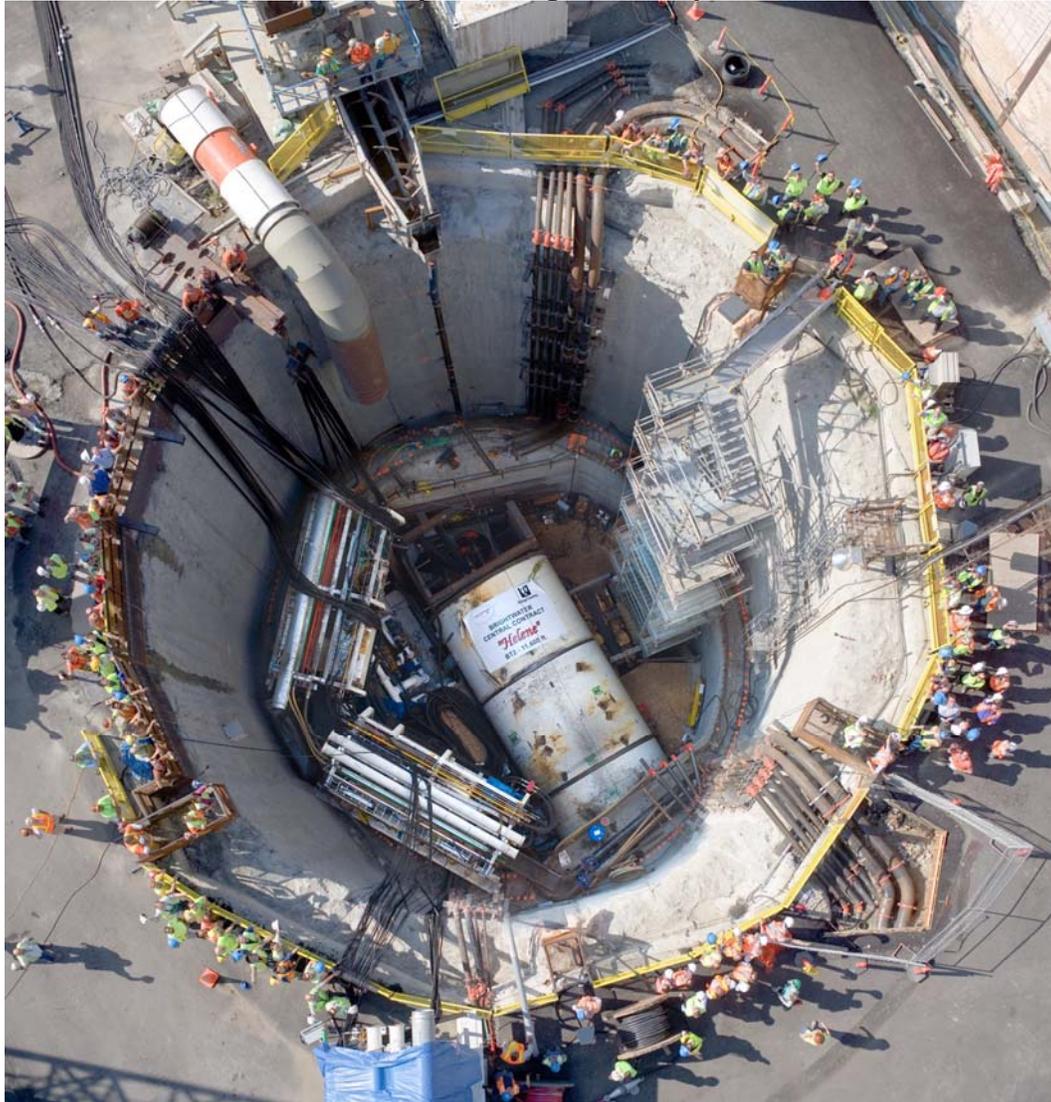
, Typical Construction Plant for a Slurry TBM
